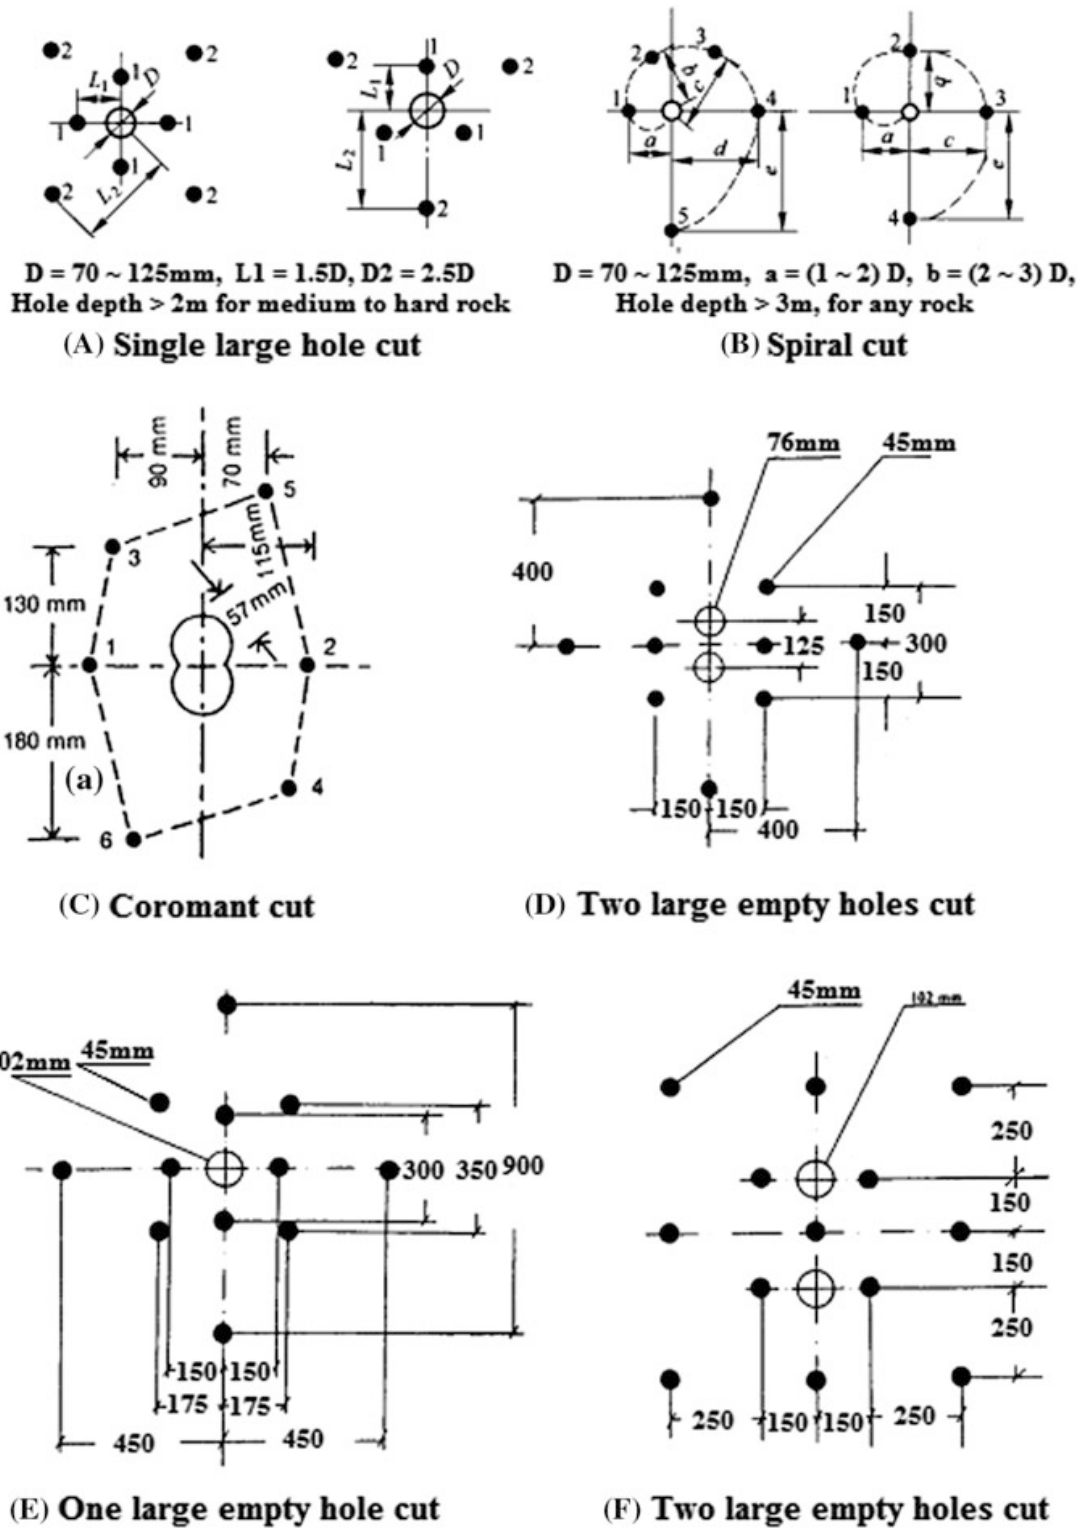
Examples of parallel-hole cuts with large relief hole(s)
